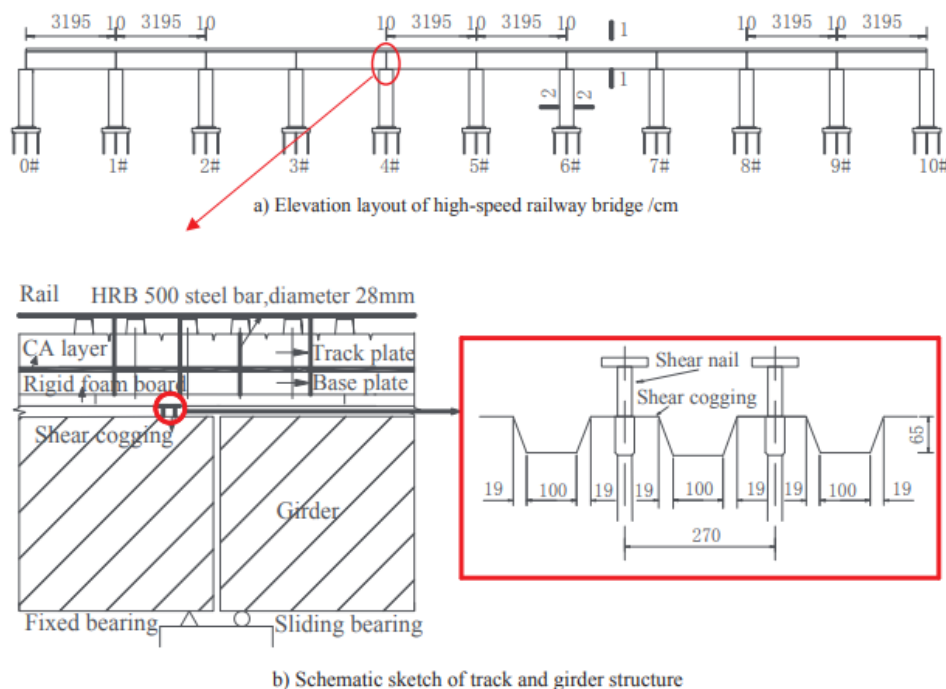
Schematic of the prototype bridge: a) Elevation layout of high-speed railway bridge/cm, b) Schematic sketch of track and girder structure (Li et al. 2020).
